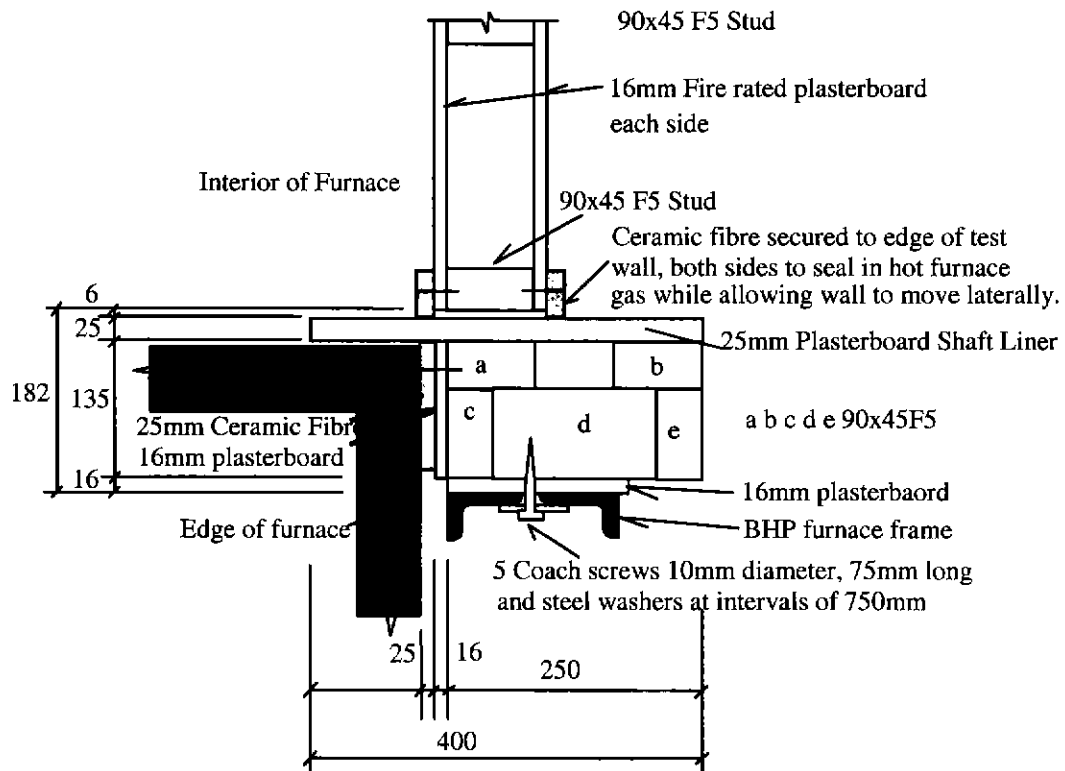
Horizontal Section through the Edge of the Wall Section showing the Wiper Seal
